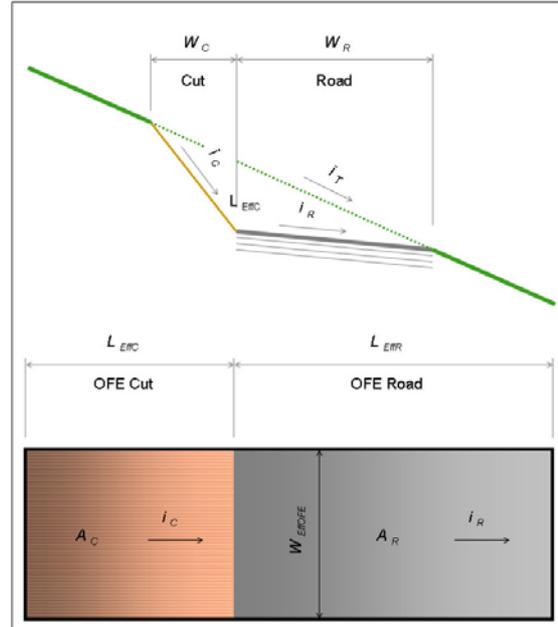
Cross section and surface elements with OFE cut and OFE Road for an outsloped forest road.
